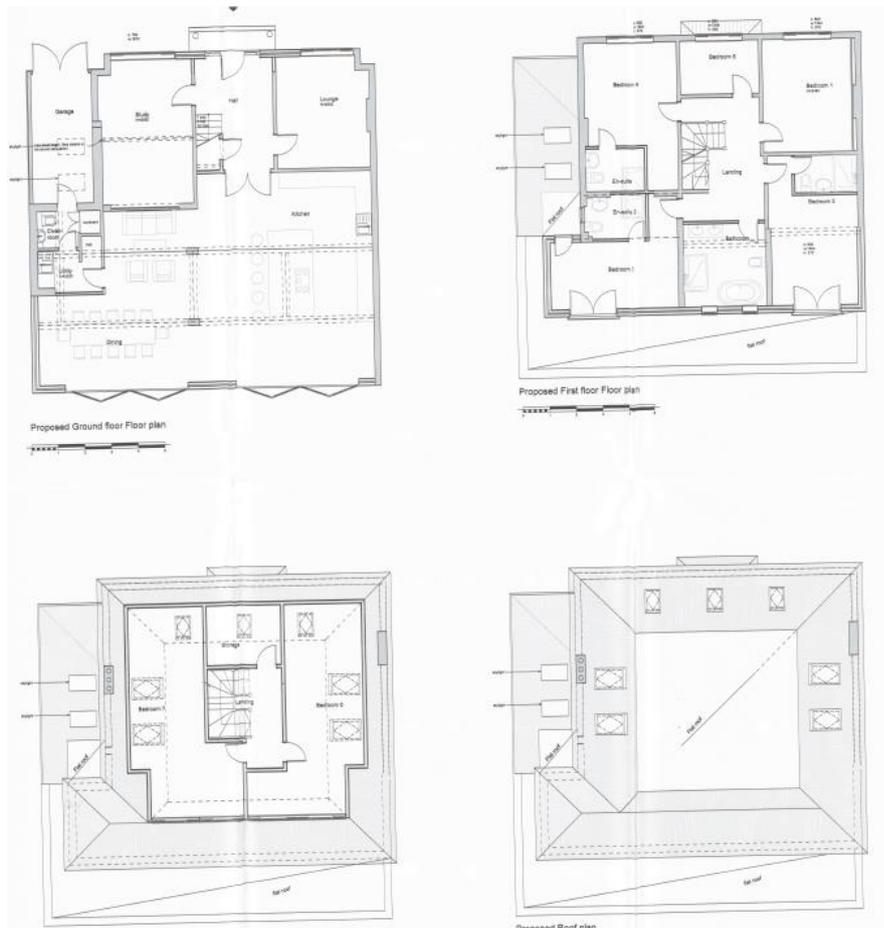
Refused 21/01466/FULL6 – Floor Plans
